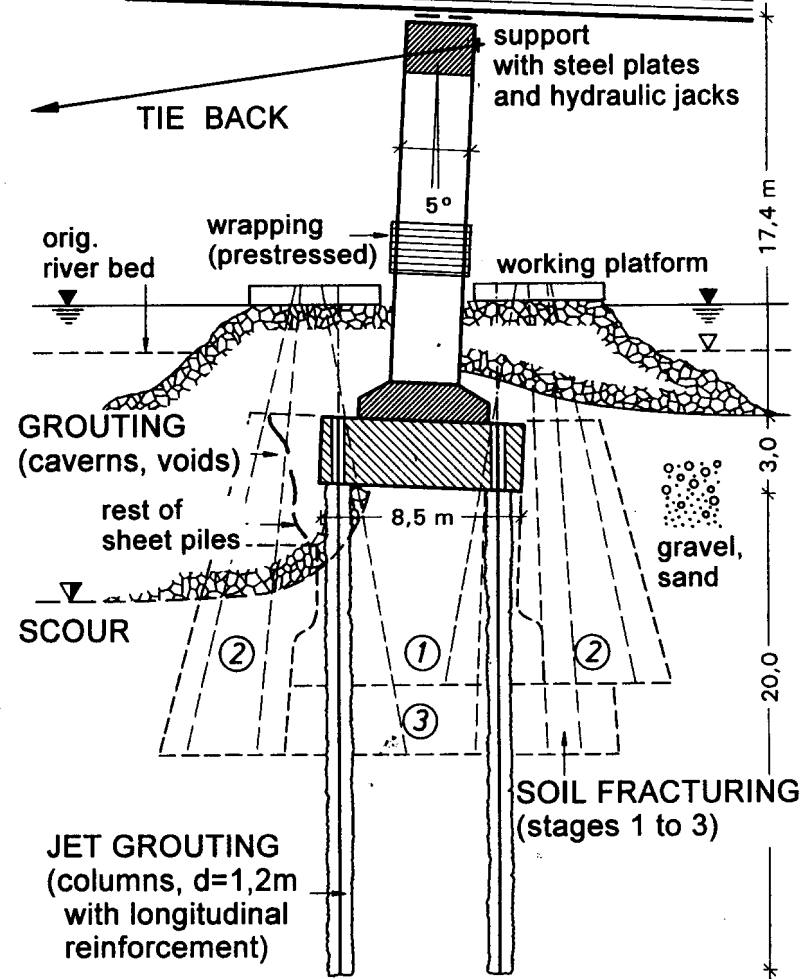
Remedial works for a river pier which had settled 1.3 m and tilted due to a 14 m deep scour. The pier is 52 m long and carries three superstructures. Geotextile expander bags in the zone of grouting (caverns, voids)
